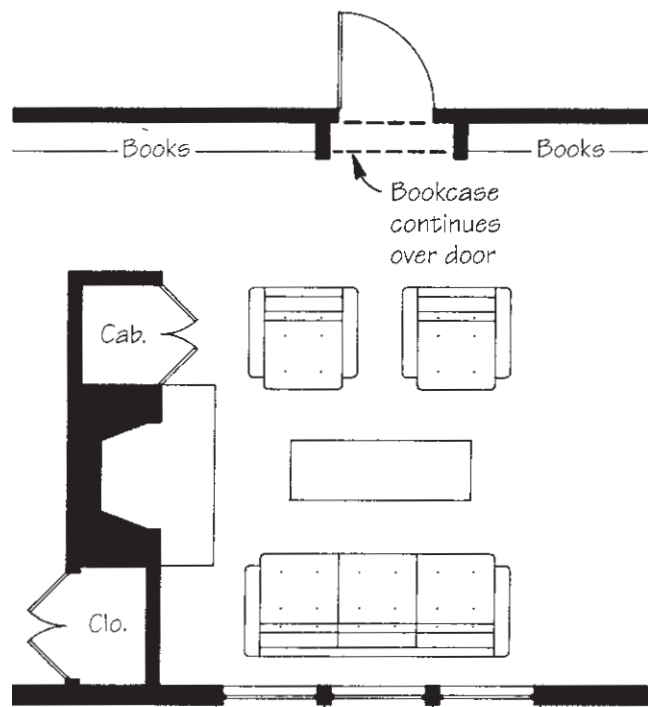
Bookshelves surrounding a doorway (top of drawing) can create an arch, which adds a graceful, spatial transition between rooms. A fireplace can also create a "thick" storage wall between rooms.
